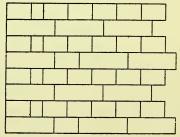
St. Andrew's Cross Bond or English Cross Bond.
